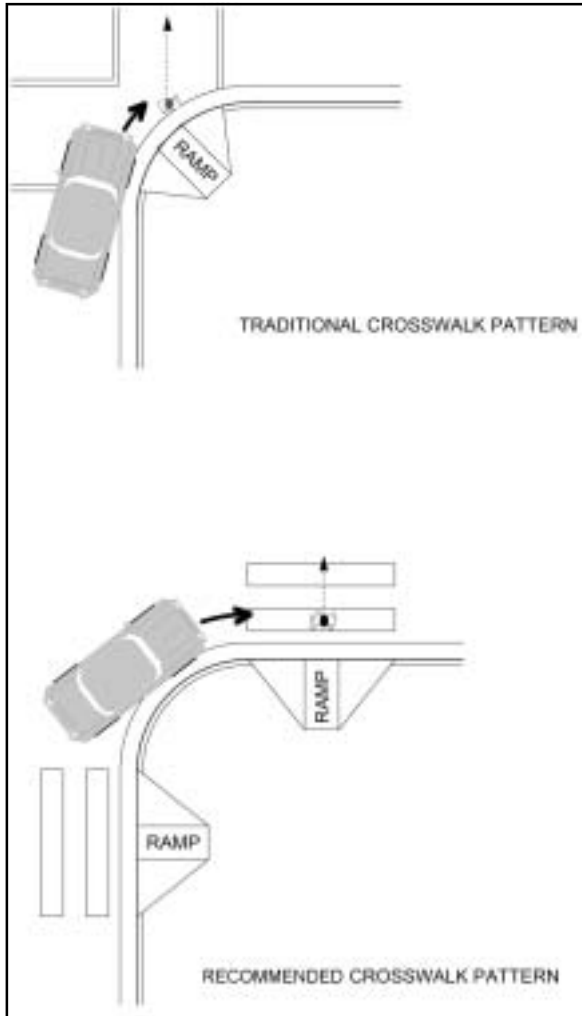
Motorists and pedestrians are more visible to each other when two sidewalk ramps are provided at each street corner.
